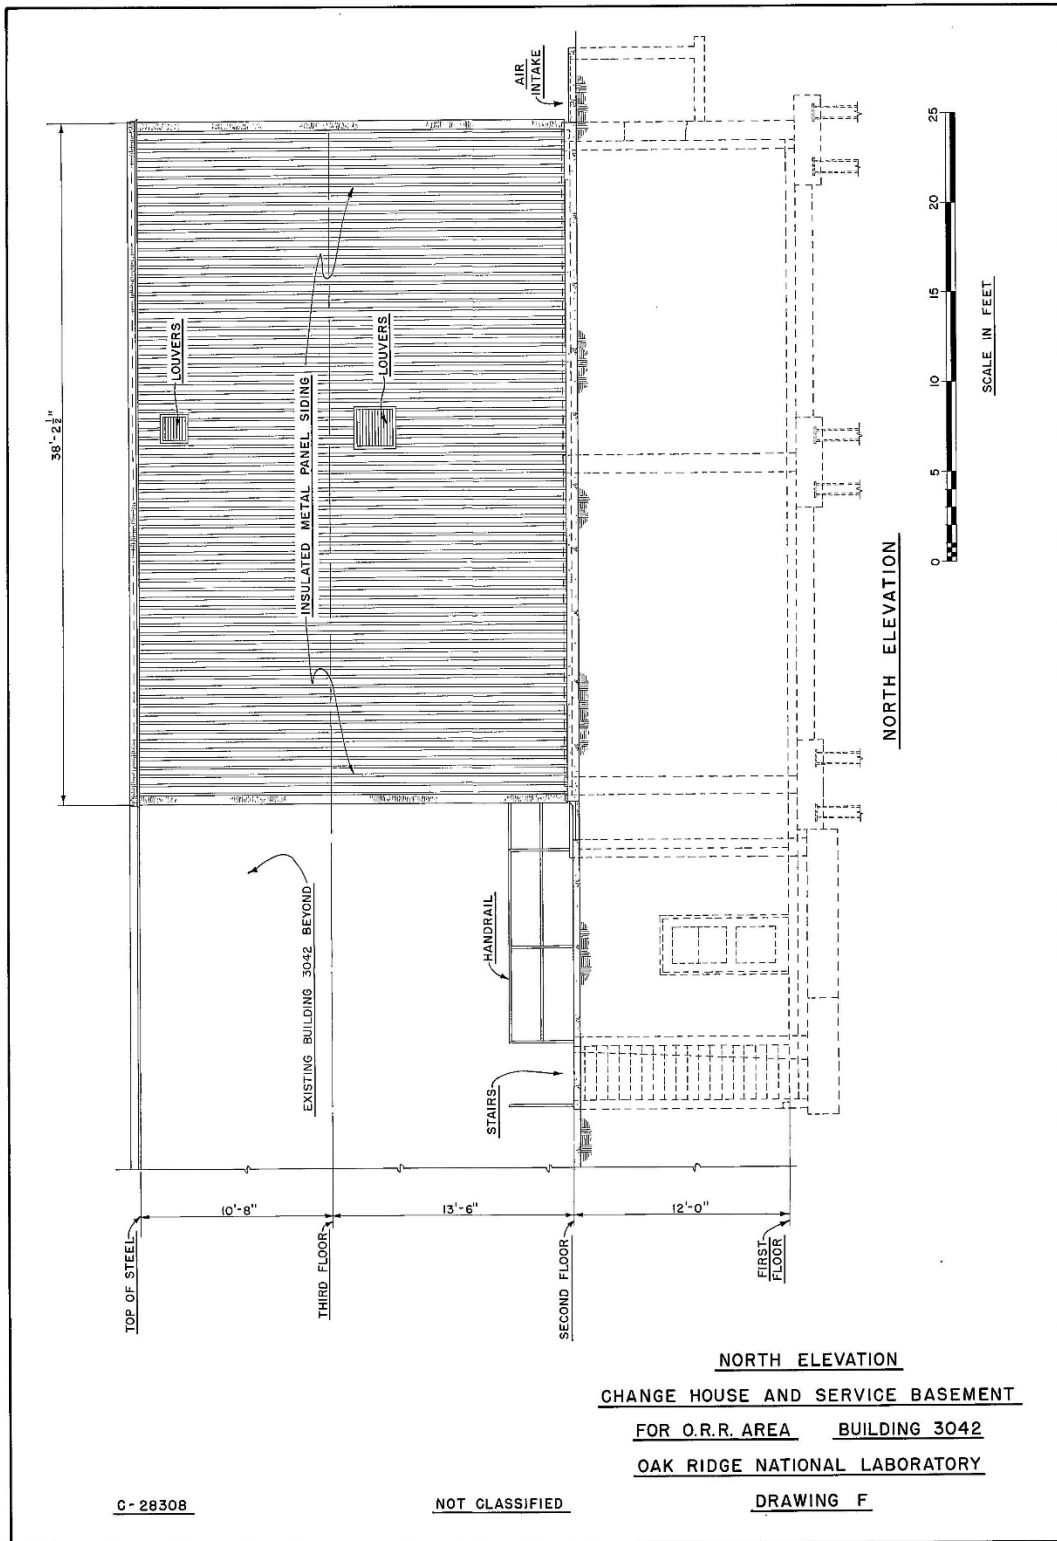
North elevation of the circa 1957 Change House and Service Basement addition to the north elevation of Building 3042 (Oak Ridge National Laboratory, n.d.).
